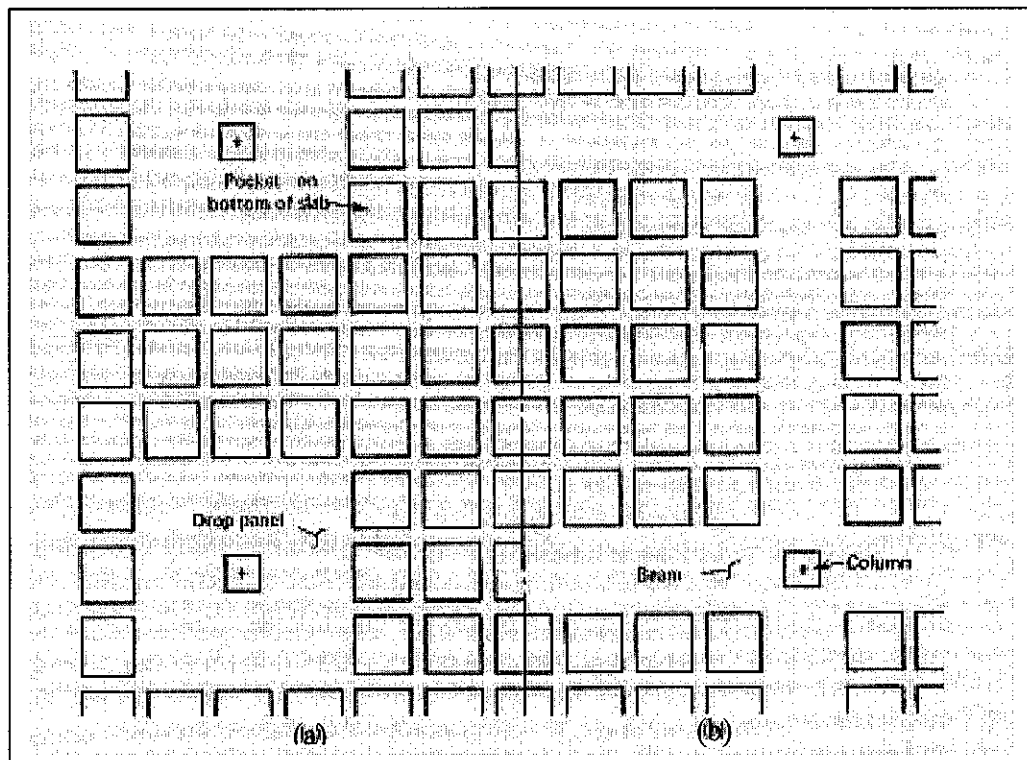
Arrangement of Waffle Slabs: (a) as a flat slab; (b) as a two-way slab.
